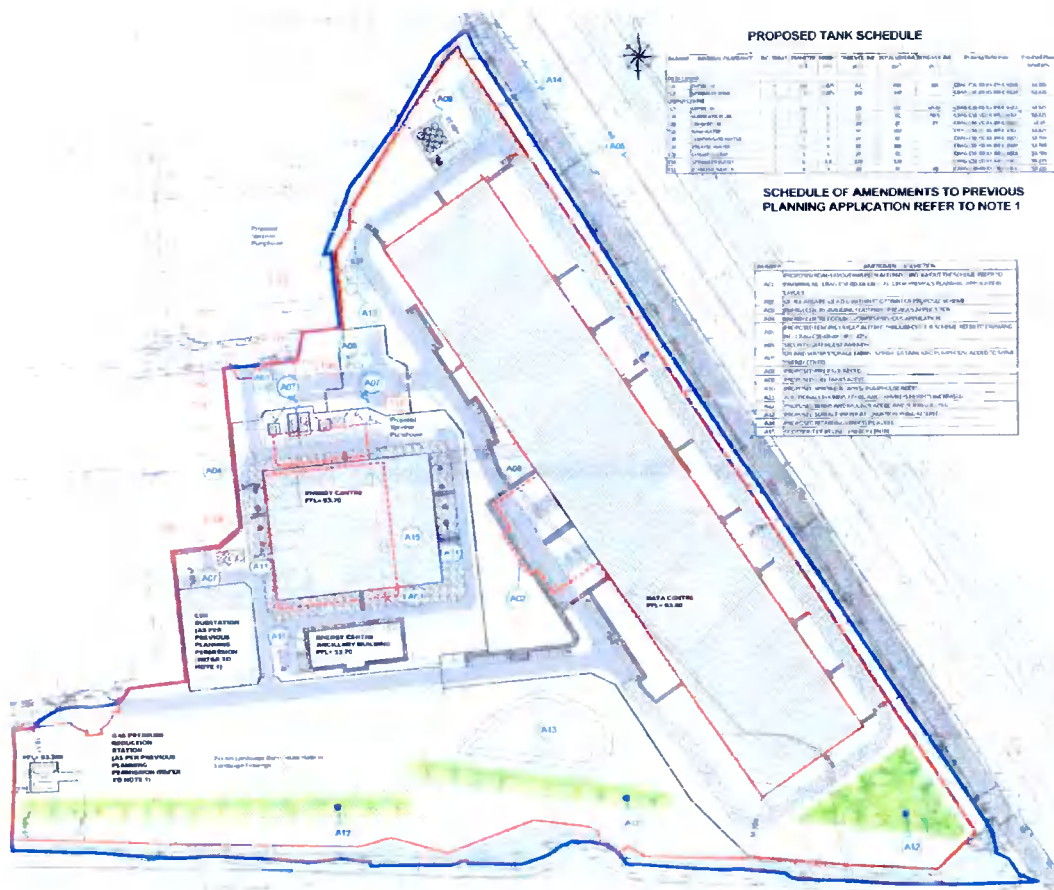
Extract from site layout plan of Reg. Ref.: SD18A/0068
